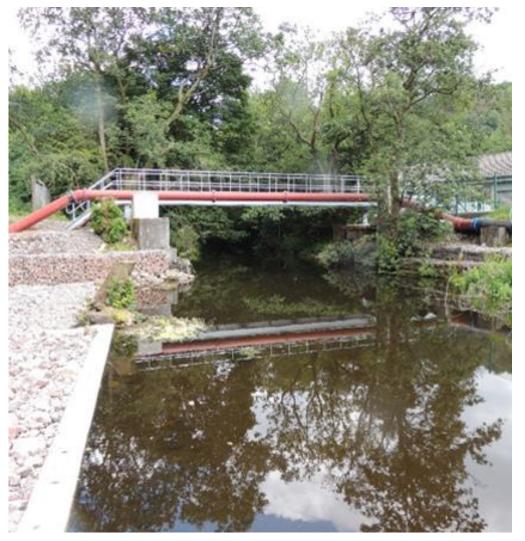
Raised pipe bridge at Pontsticill. © Welsh Water
